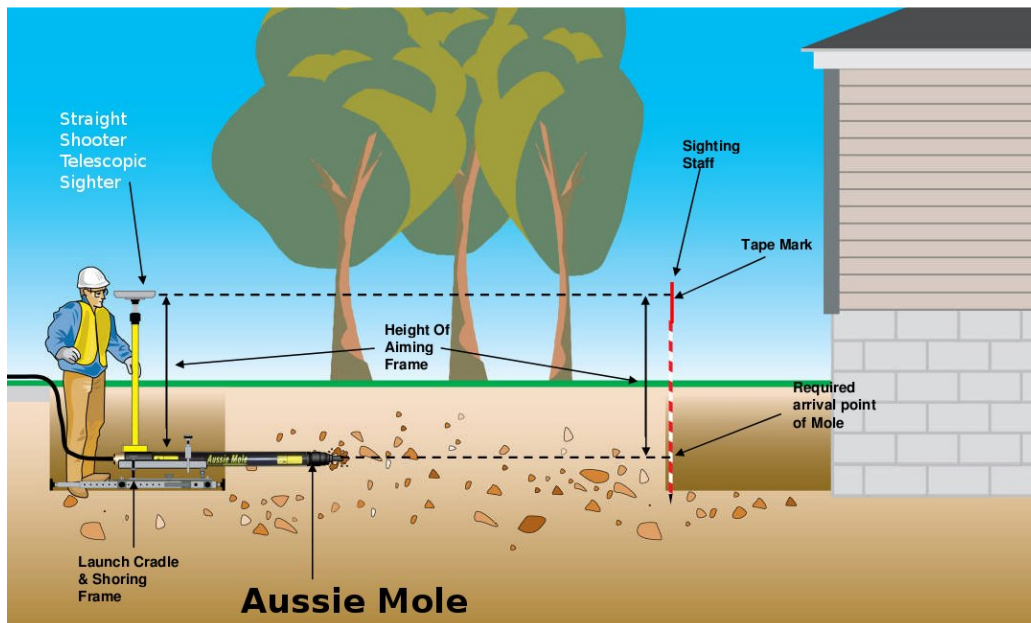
Compaction Machine (No Dig Equipment, 2012)
